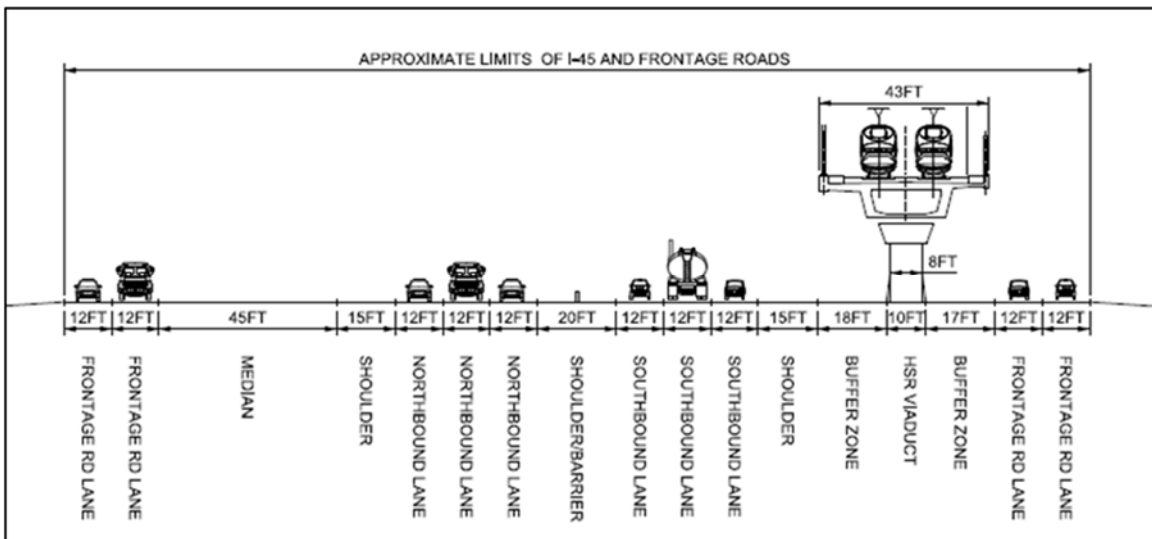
Proposed HSR Typical Section along IH-45 Looking South
